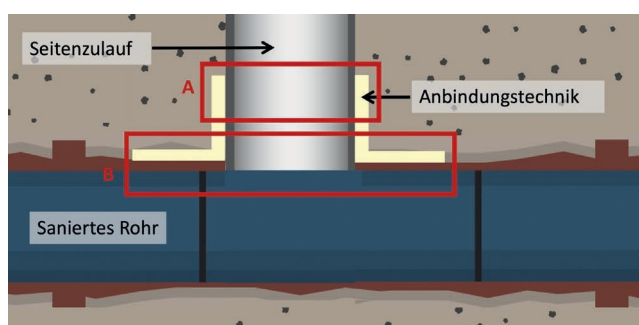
Connection of lateral sewers in open excavation on the outer diameter of the pipes.
